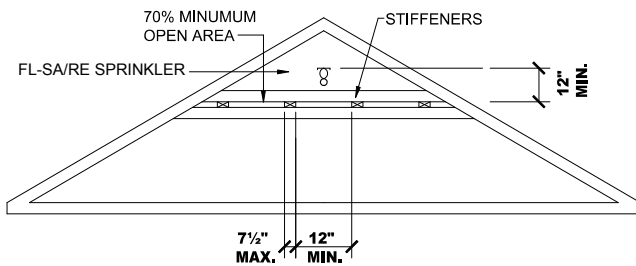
DEFLECTOR ABOVE STIFFENERS AND HORIZONTAL WEB MEMBERS (NO OBSTRUCTION)
